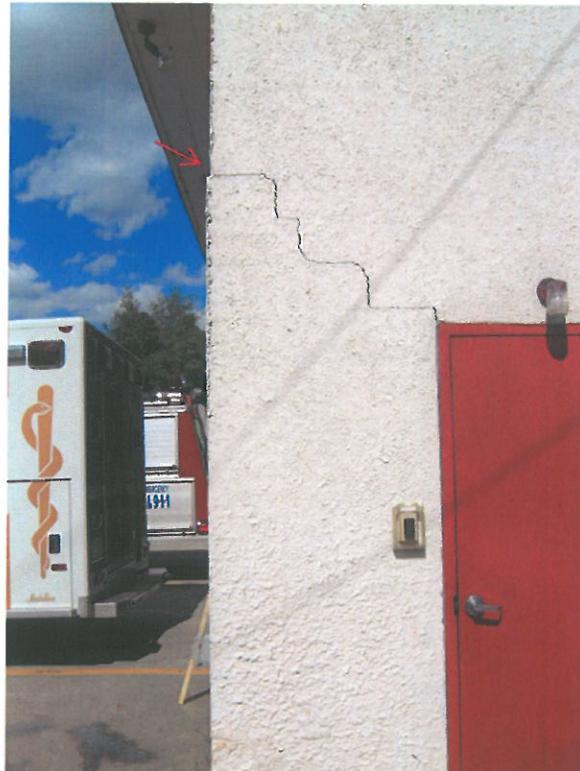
view of step crack on southeast side. Note that there is displacement of the wall on the southwest side.
